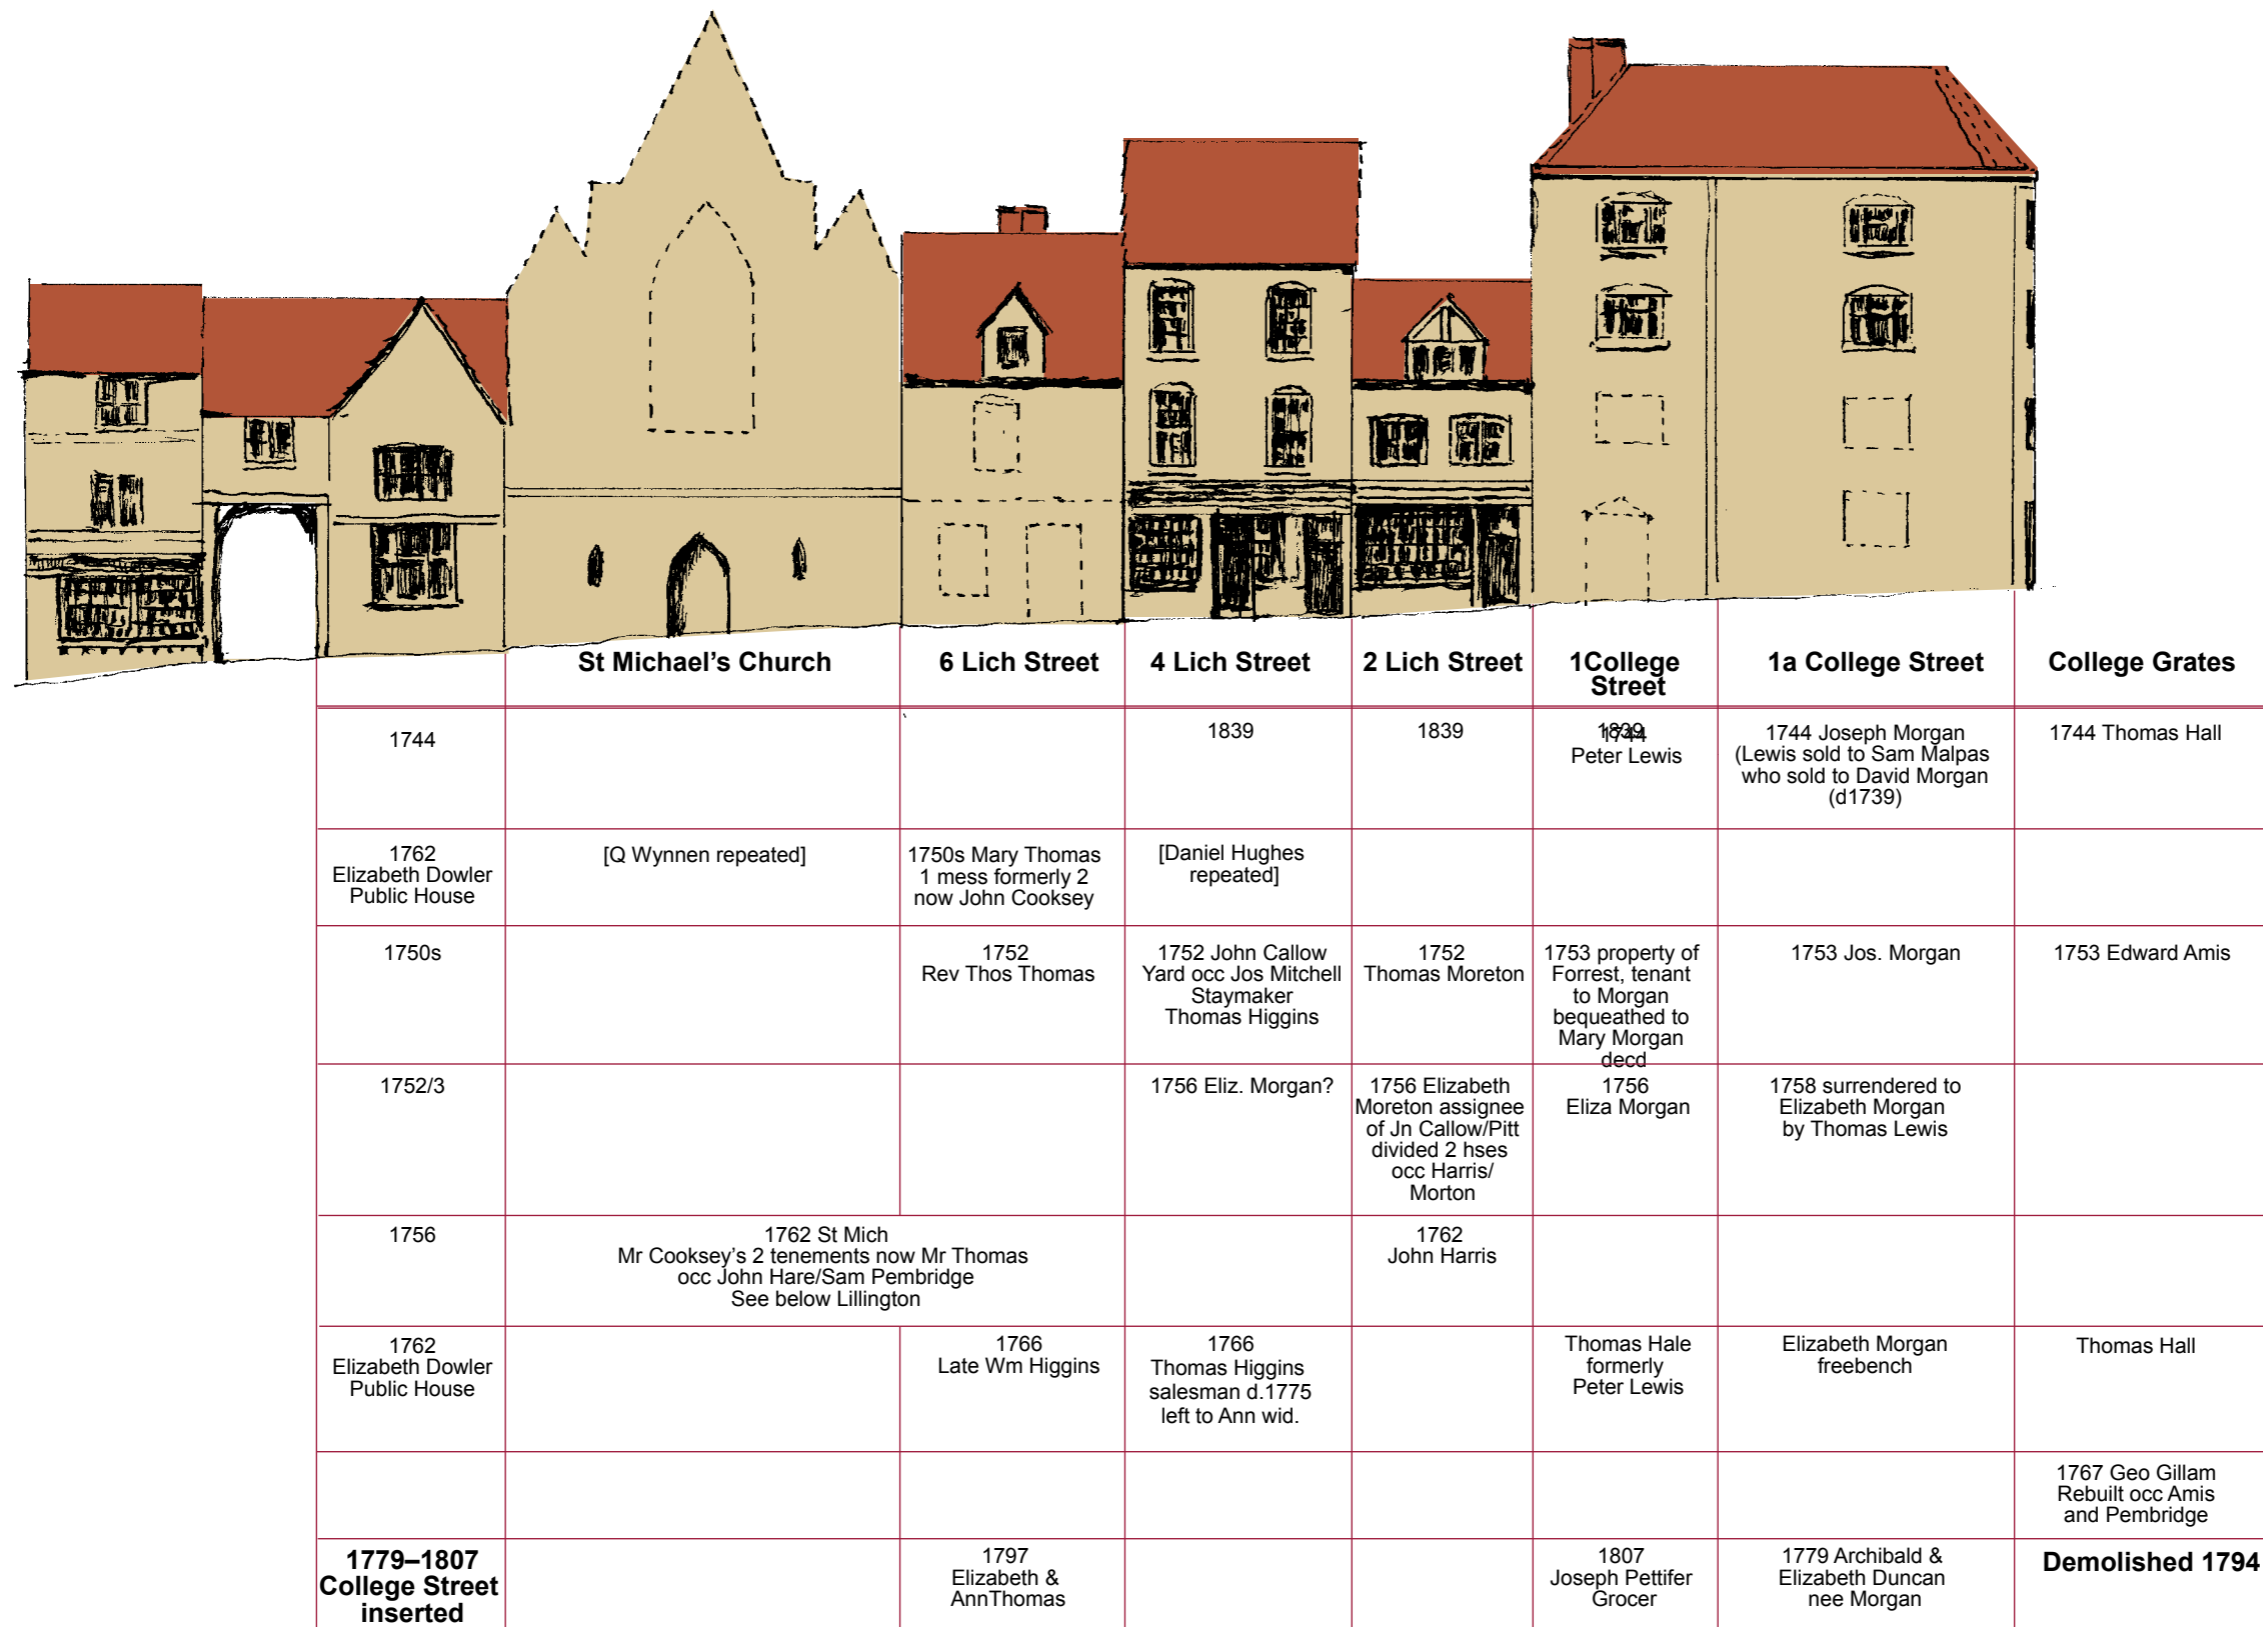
Lich Street south - Reconstructed street frontage and occupation from the post-medieval to modern period (1744-1767)
